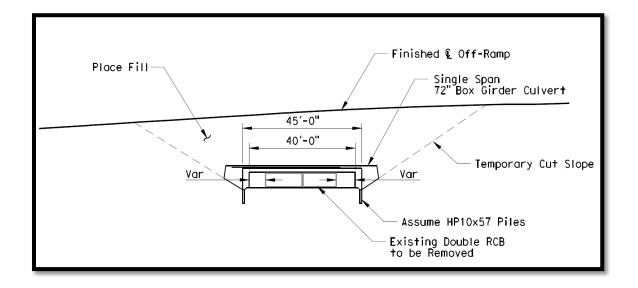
Cross Section of Proposed Structure for Las Vegas Creek at SR 101 Southbound Off Ramp
